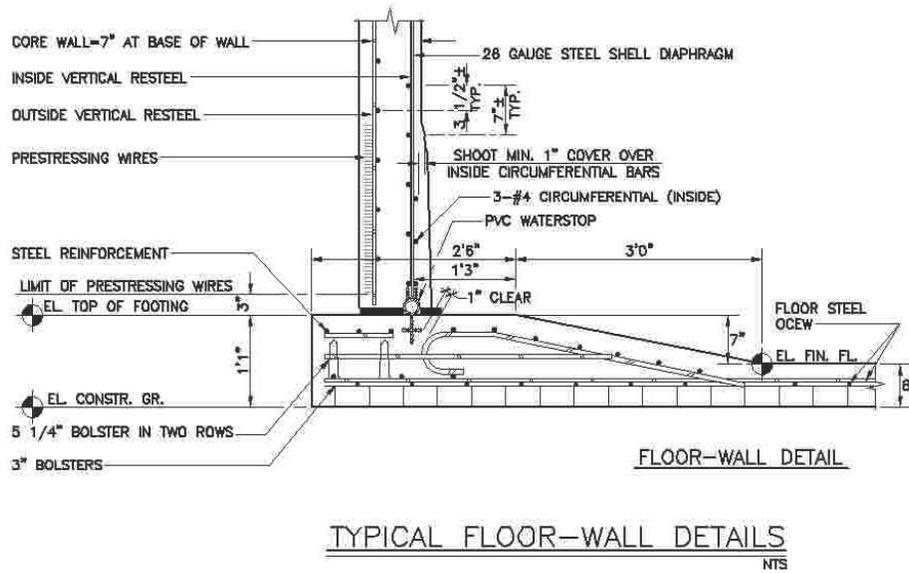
Prestressed concrete water tank section. (Source: adapted from personal communications and engineering drawings as acquired from industry contacts.)
